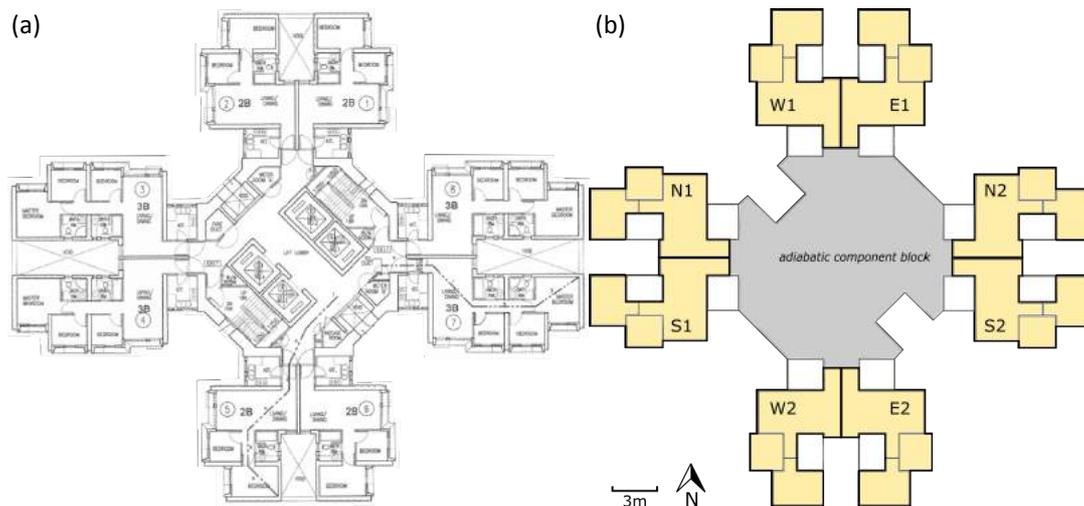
(a) Building layout plan of a Concord type PRH and (b) a simplified layout used for building simulation (only the parts highlighted in yellow were considered in thermal calculations). Flats facing different orientations are labelled accordingly.
